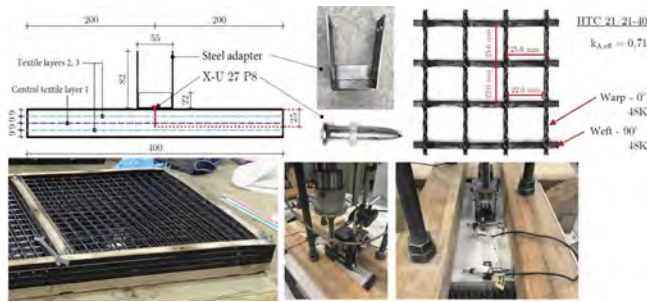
Specimen geometry and textile layout (top) and casting and testing configuration (bottom).
